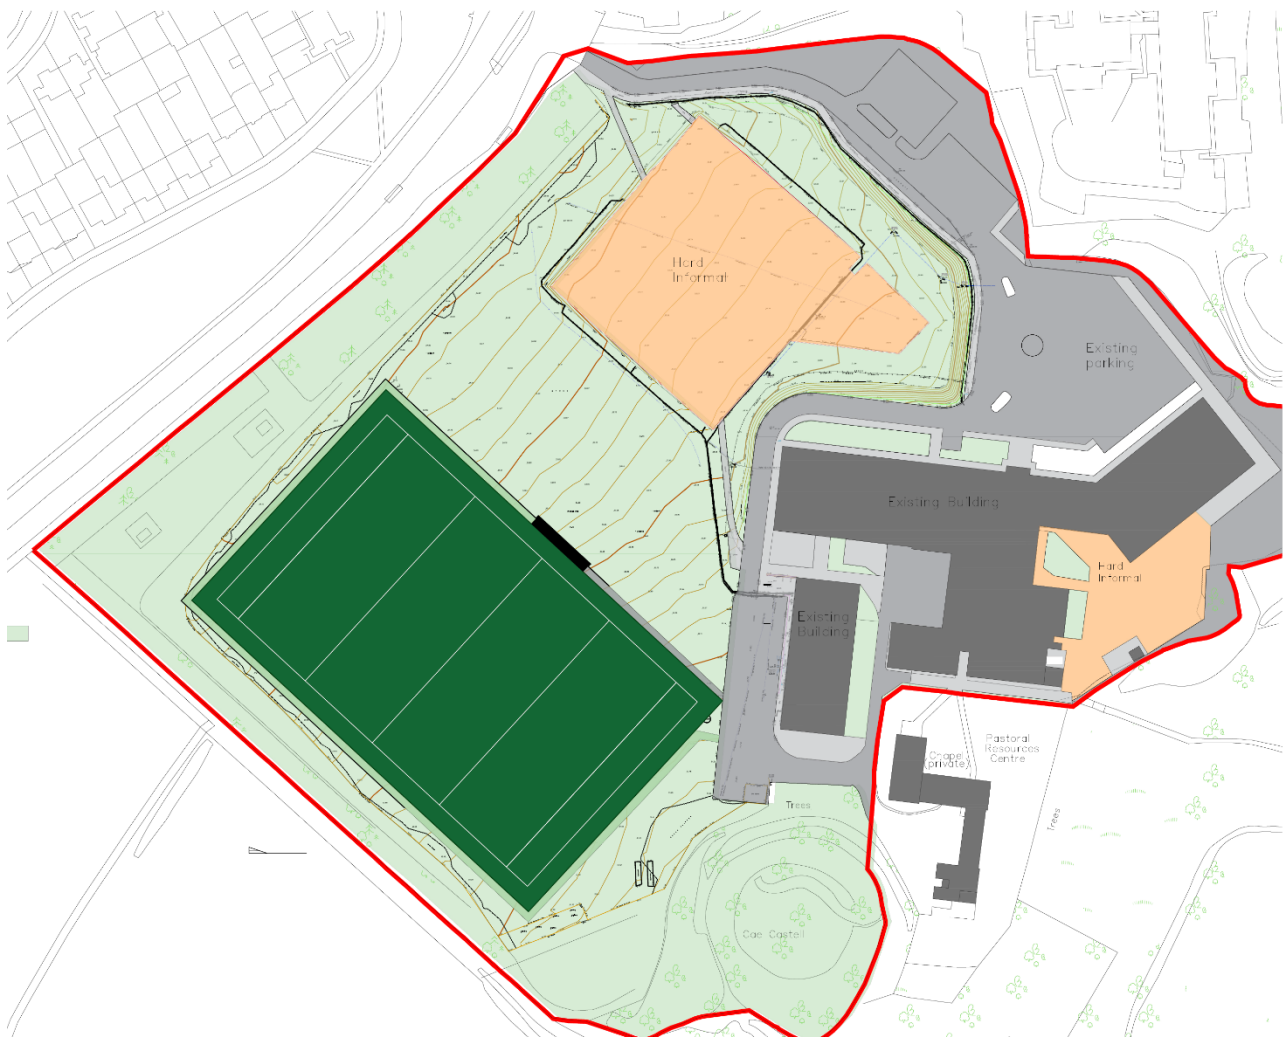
Proposed 3G Pitch Layout (Option 1) - St Illtyd School
